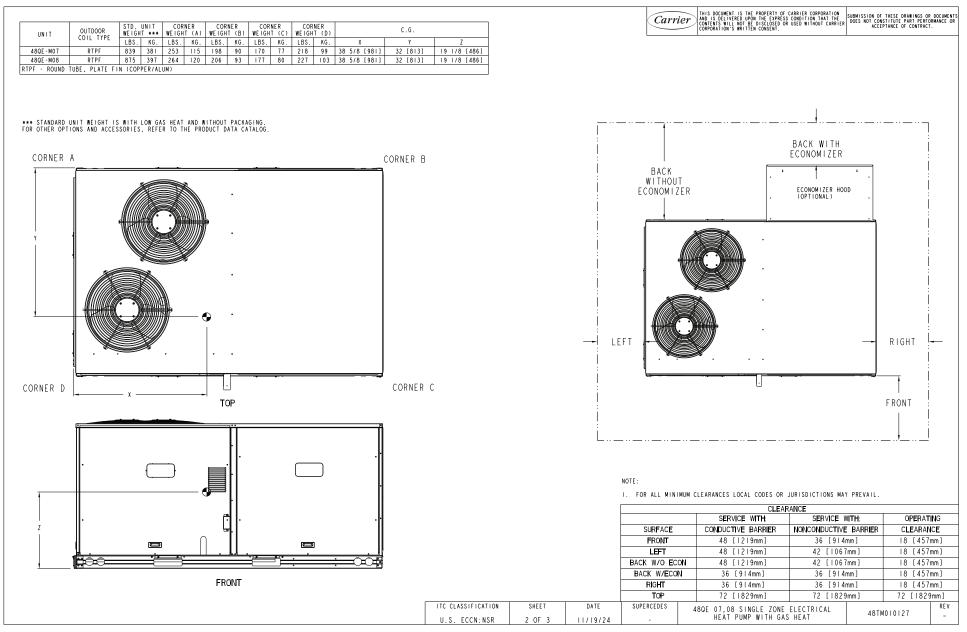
48QE 07-08 Unit Dimensional Drawing (cont)
